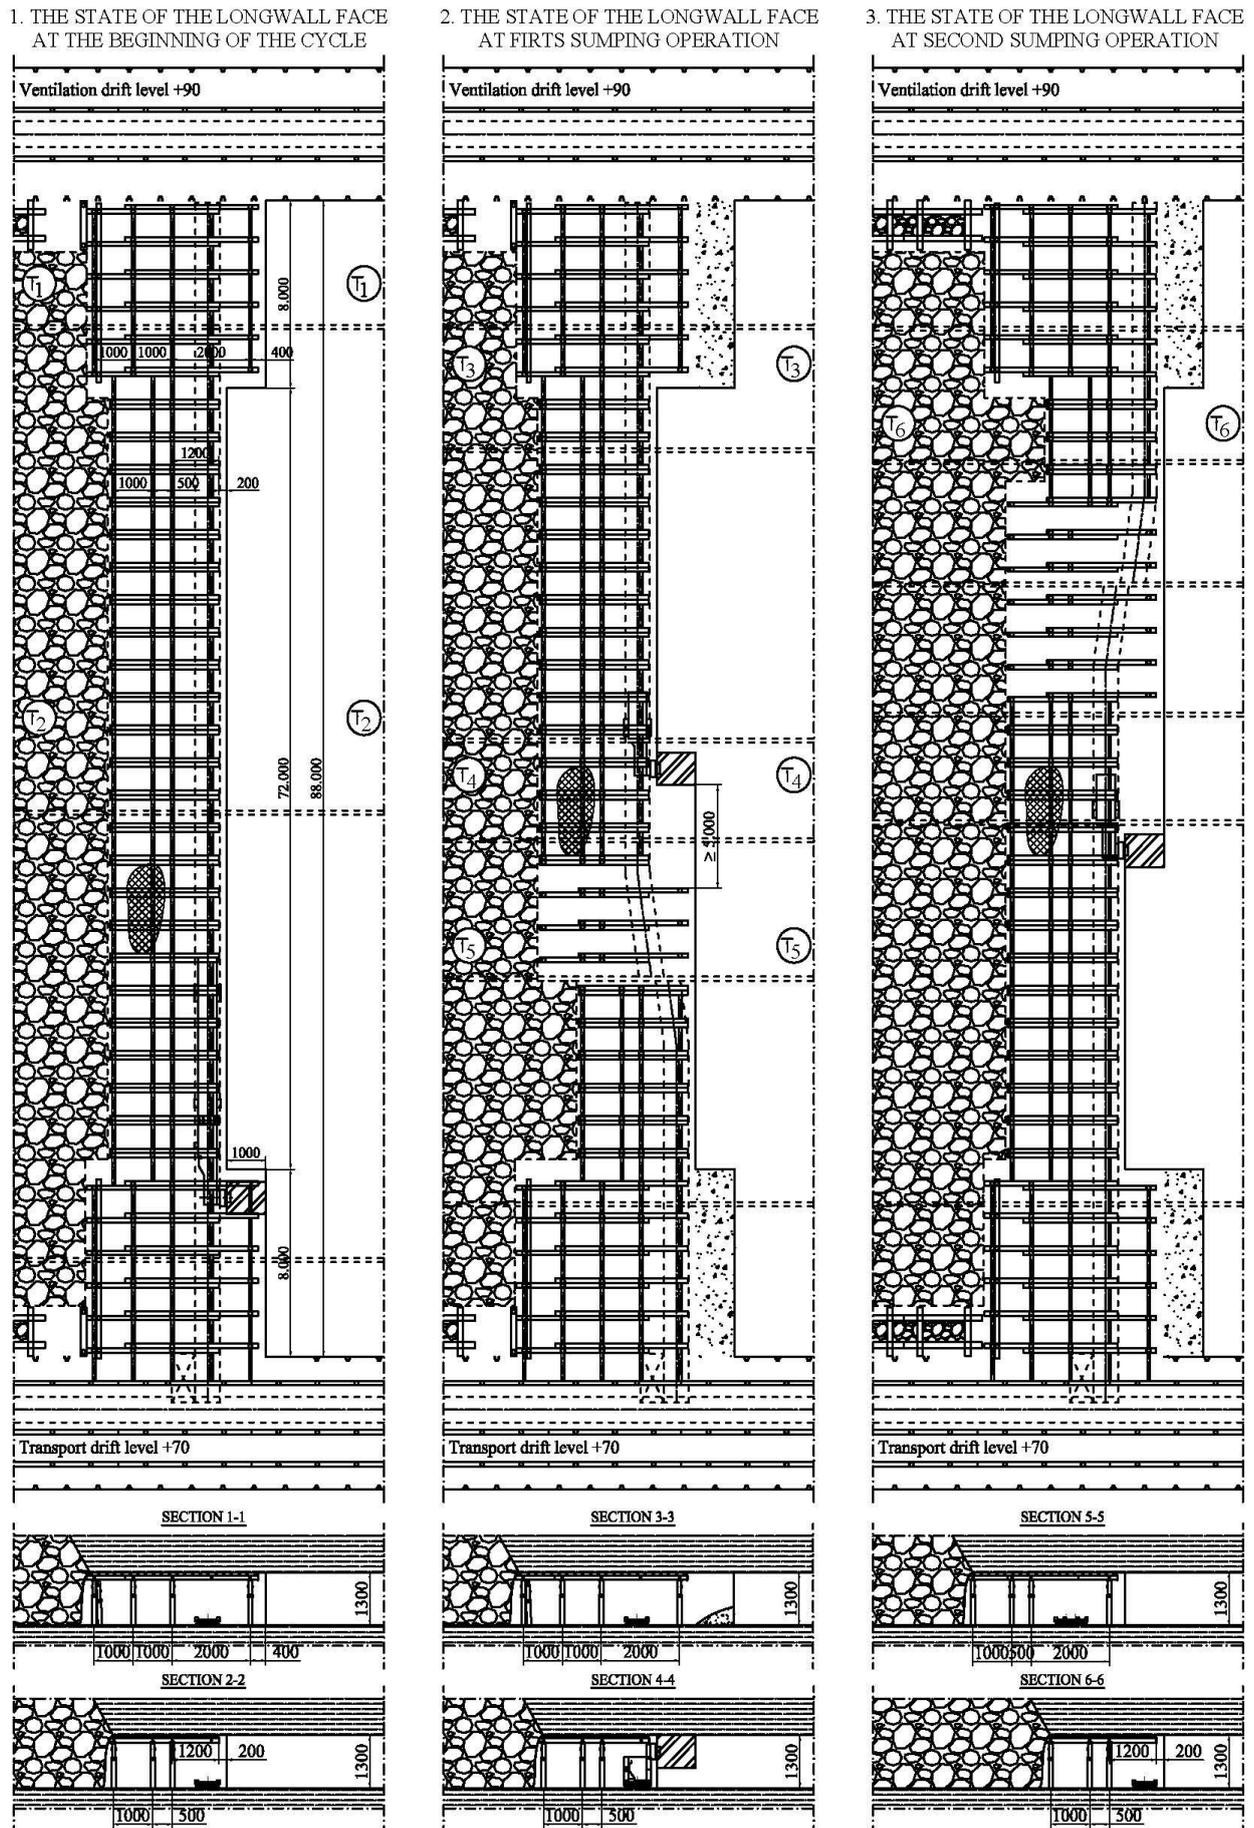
Support plan for the longwall face № 10-2, Nam Khe Tam mine.
